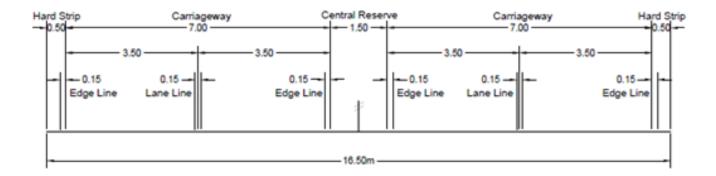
Type 2 Dual Carriageway (D2AP) Cross-section
